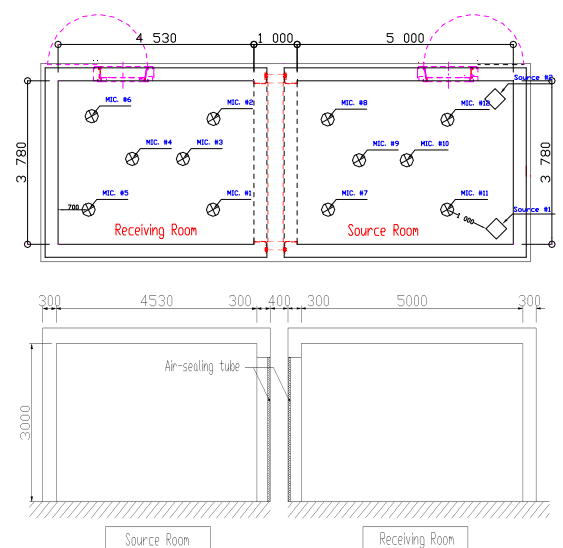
Drawing of test room (Top : floor plan, bottom : section)
